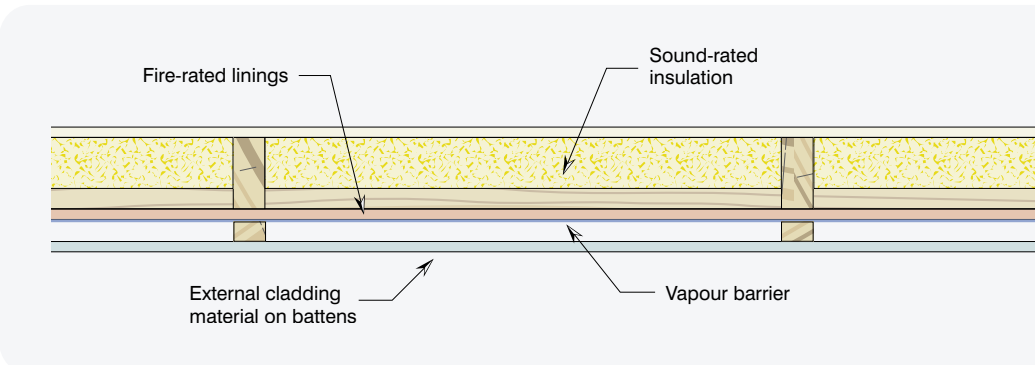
Fire-rated external stud wall systems (outside only) – plan view.
